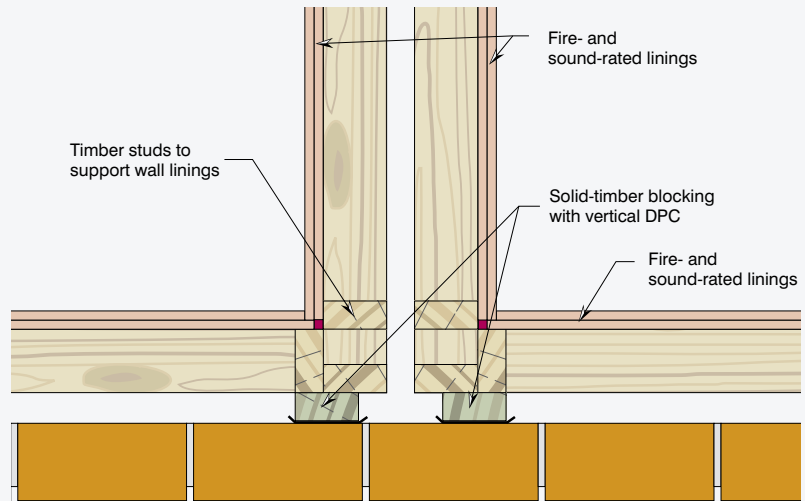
Cavity barrier (using timber blocking) at the junction of fire-rated bounding wall and external wall – plan view.
